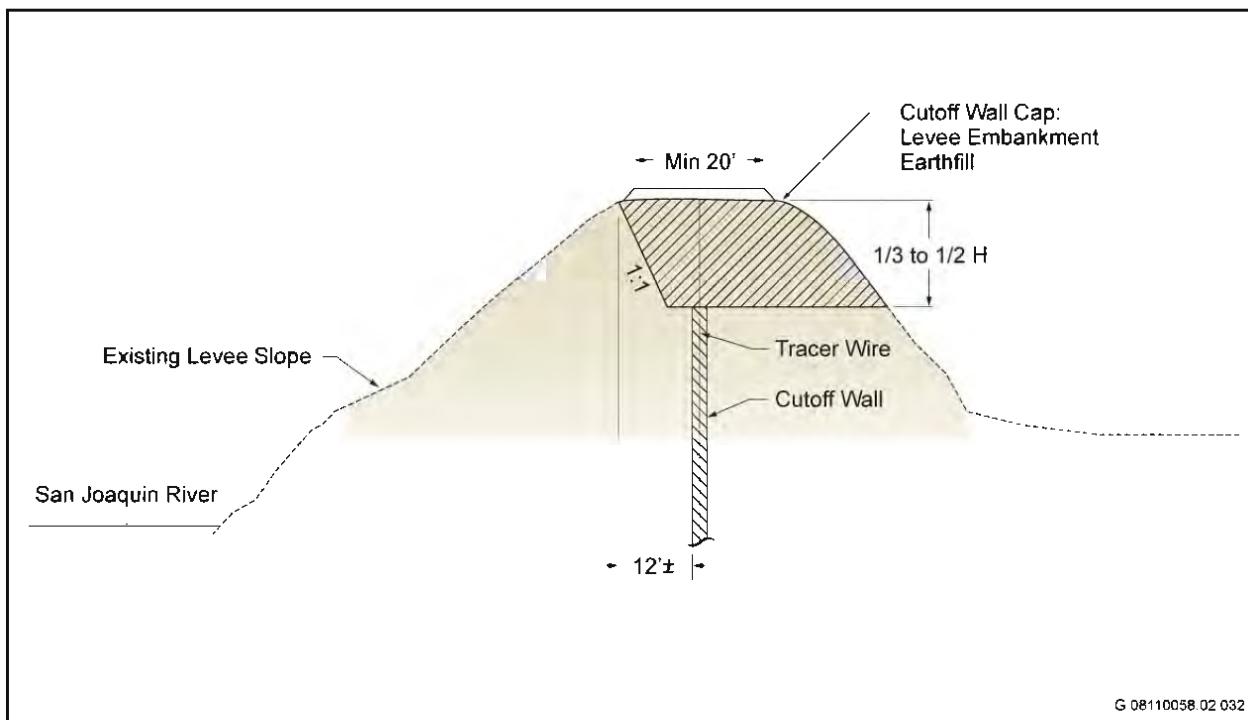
Typical Open Cut Method of Cutoff Wall Construction
